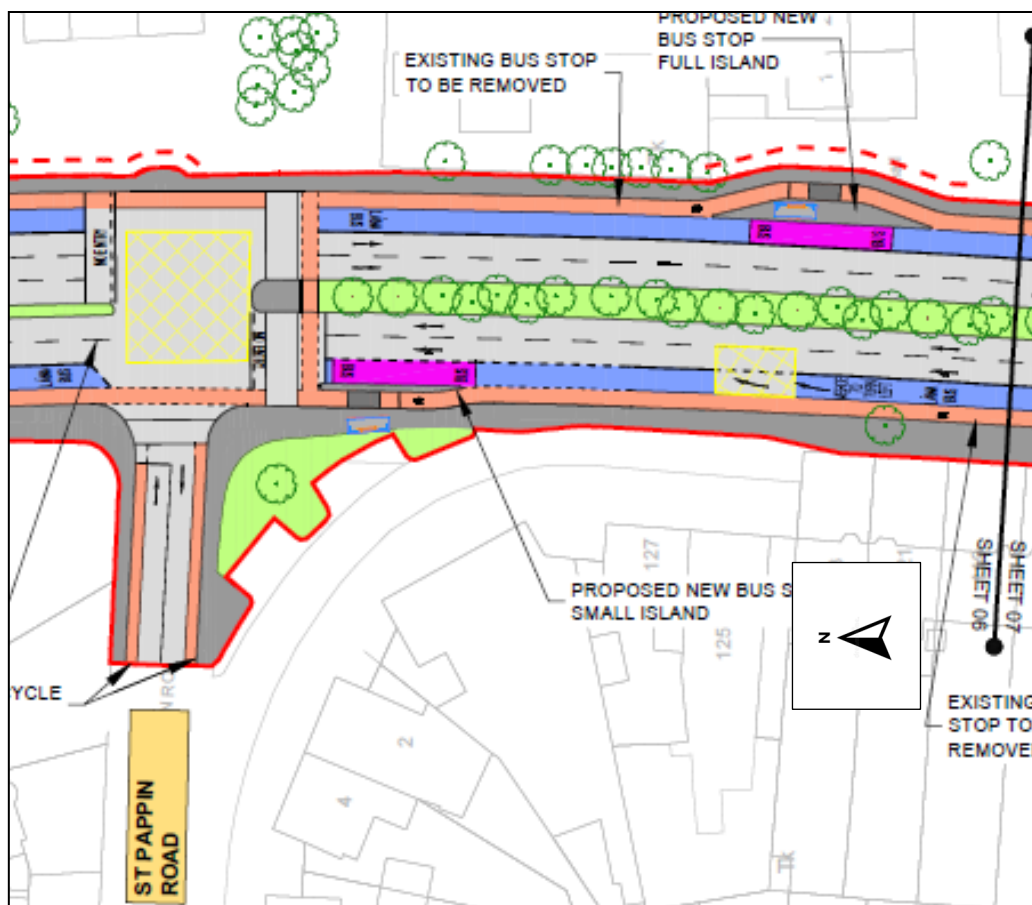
Extract from General Arrangement Drawing Sheet 6 at Shops beside St. Pappin Road
